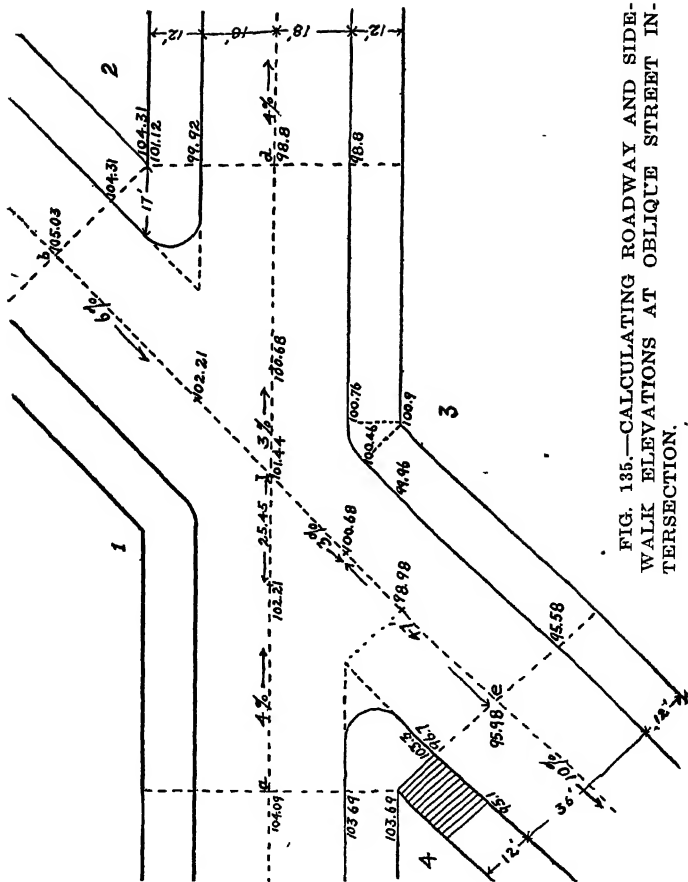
CALCULATING ROADWAY AND SIDE-WALK ELEVATIONS AT OBLIQUE STREET INTERSECTION.
